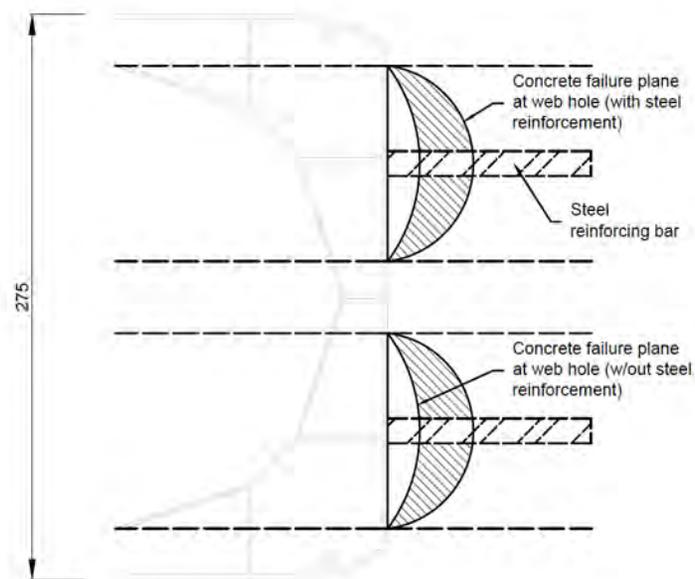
Illustration of dome shaped failure planes at web holes with steel reinforcement
